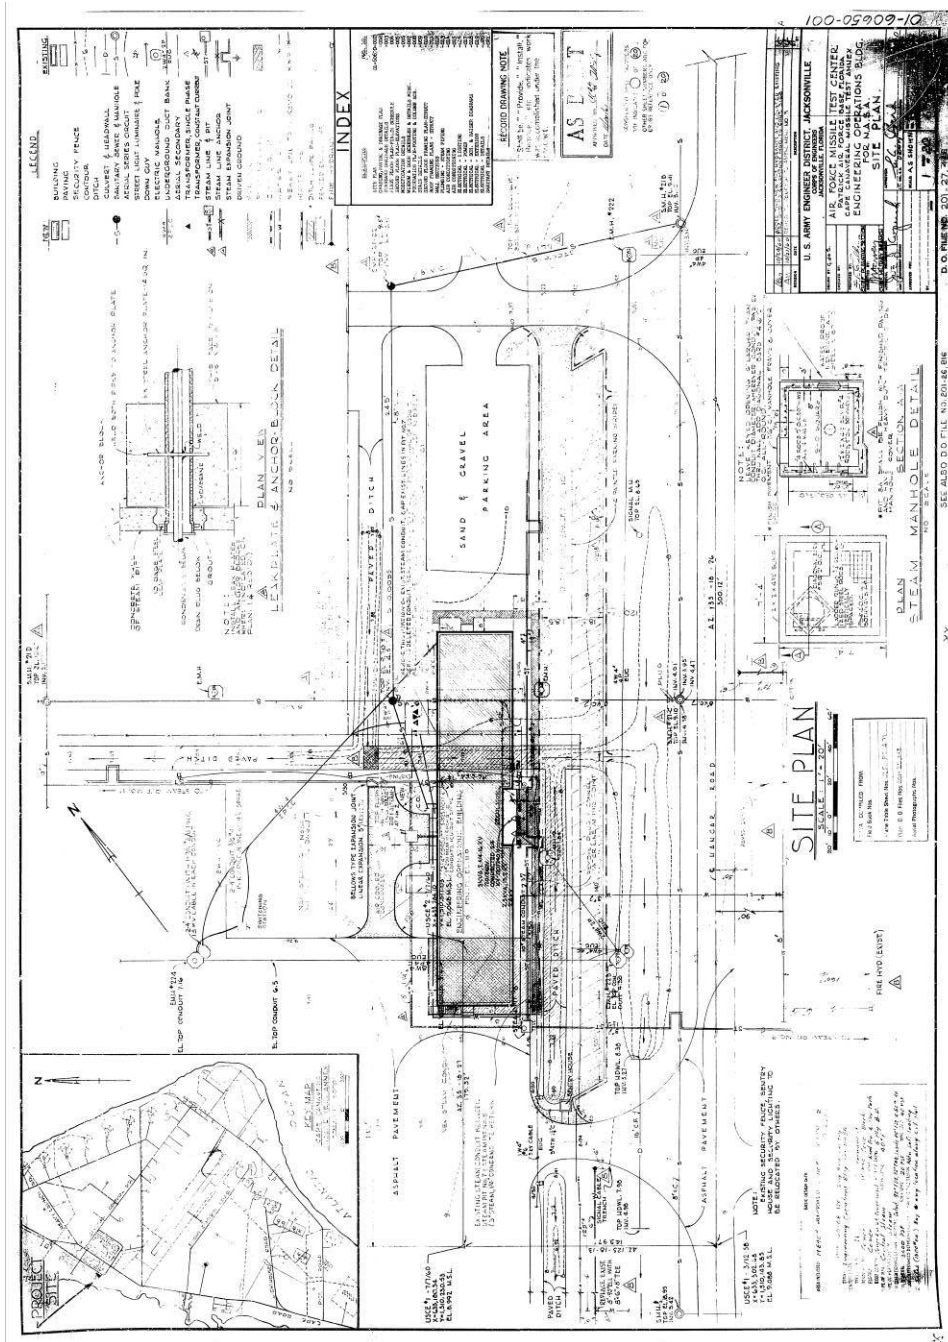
ACOE, Engineering Operations Building for NASA, Site Plan, October 1960, Sheet 1 of 20.
